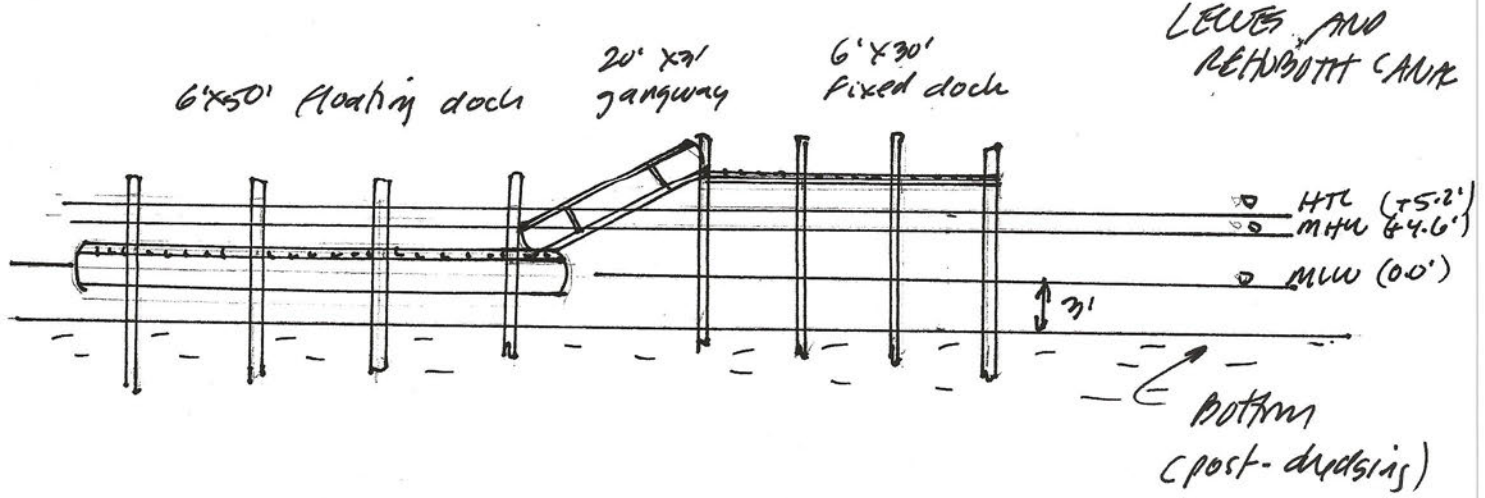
Cross-sections of proposed docking facilities. Sketches for permit application purposes only.
